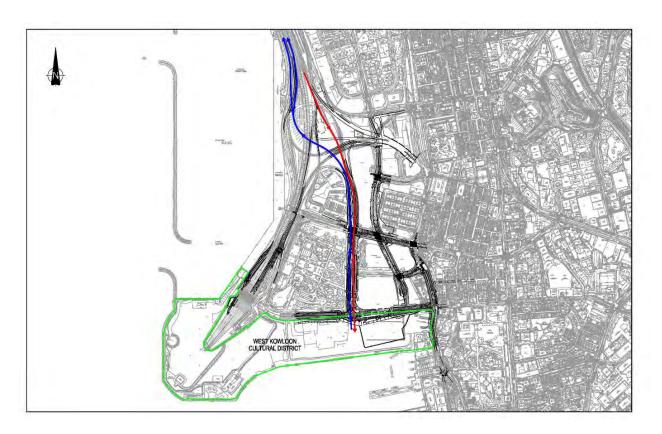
Construction Access Points and Traffic Routing for Batches 2+3 Construction Upon Commissioning of LCR-AURW Underpass
